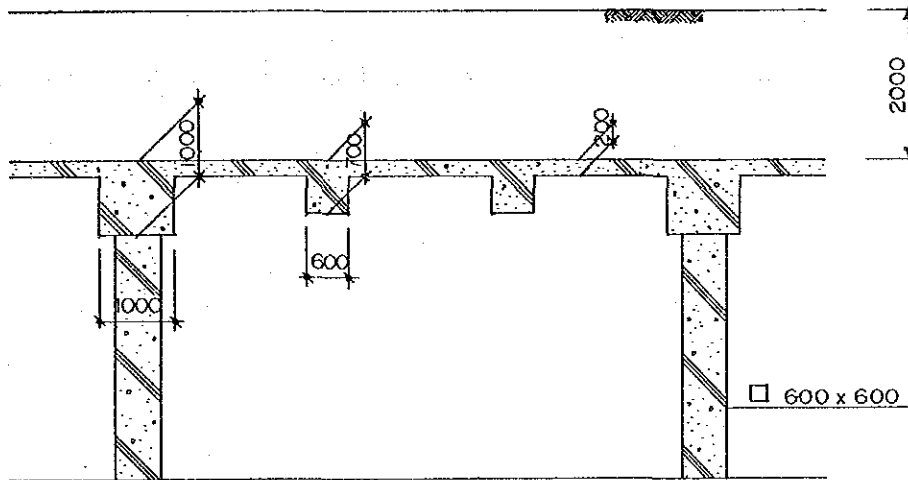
CROSS SECTION OF UNDERGROUND PARKING
